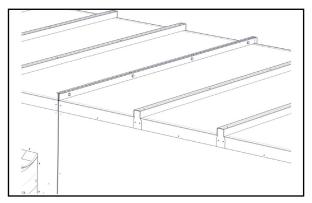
ROOF BEAM ASSEMBLY BOLT LOCATIONS
